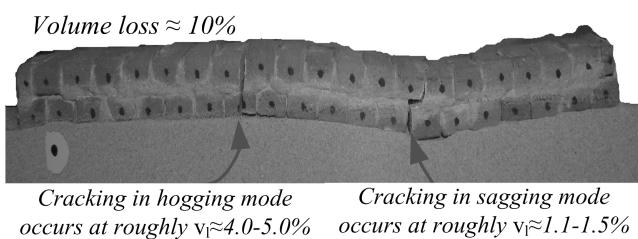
Observed cracking of building MAS-2L in centrifuge testing.
